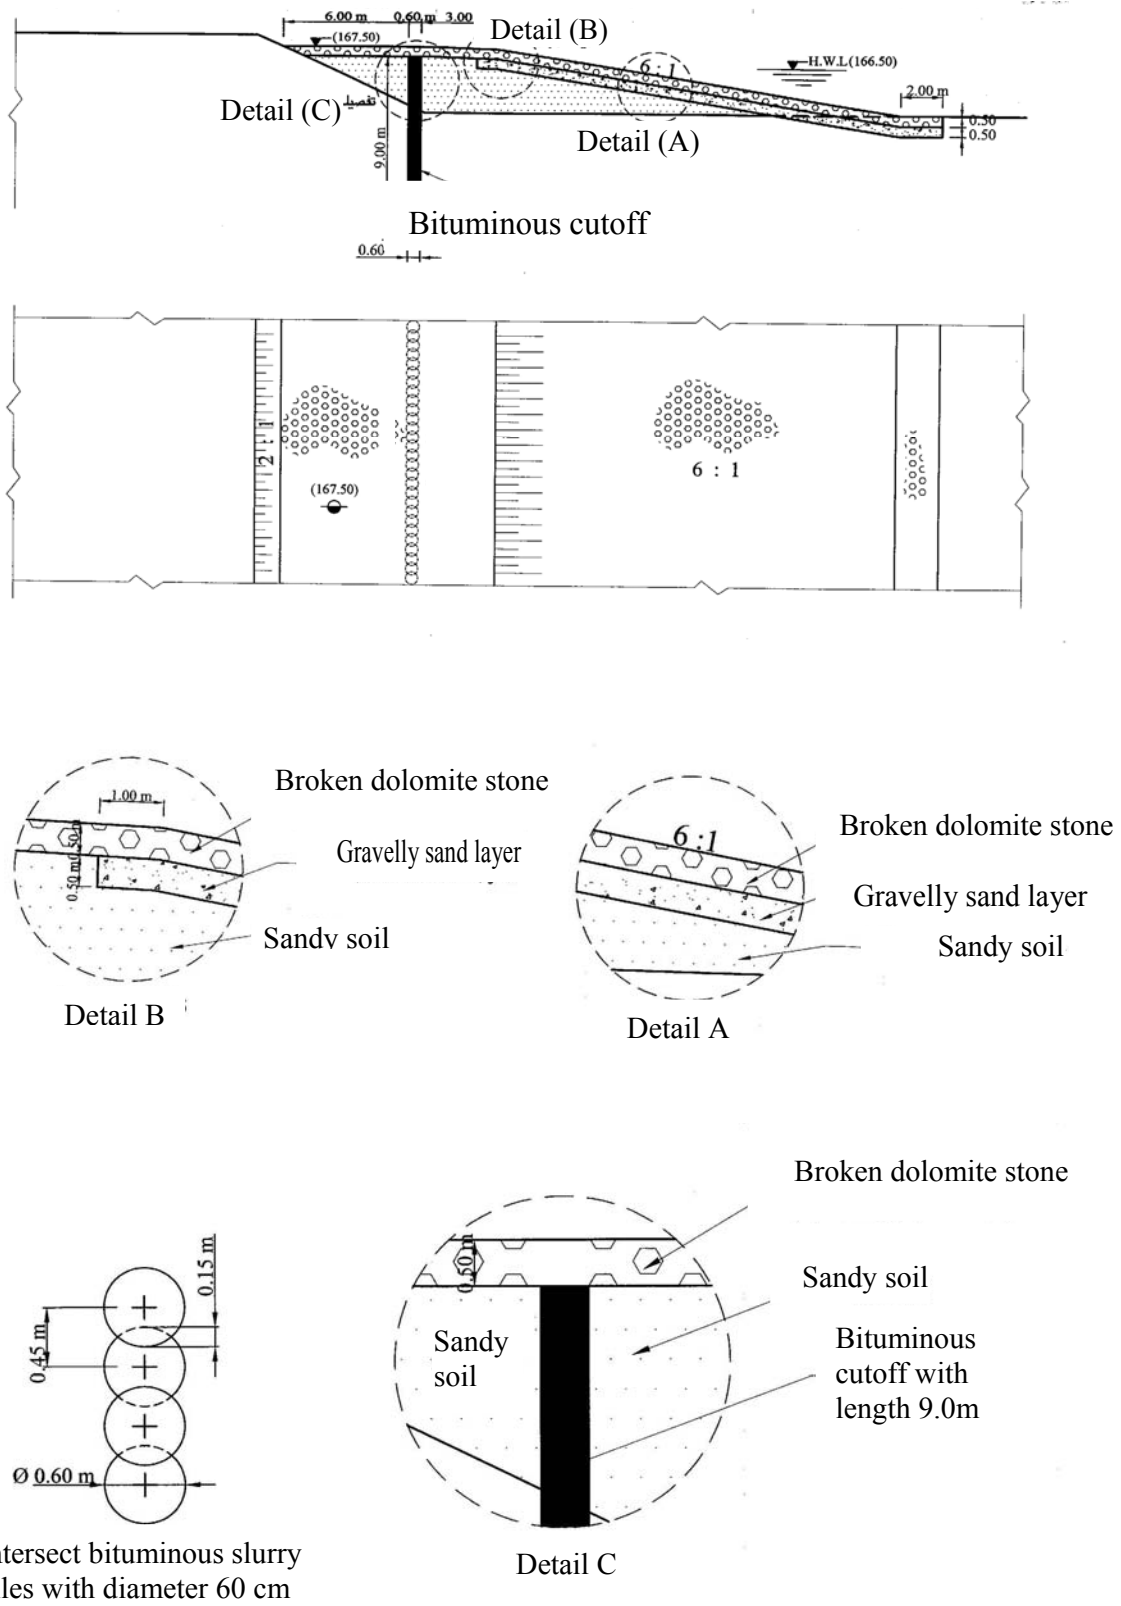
Layout and details of the suggested cross section of the El-Zayat lake
